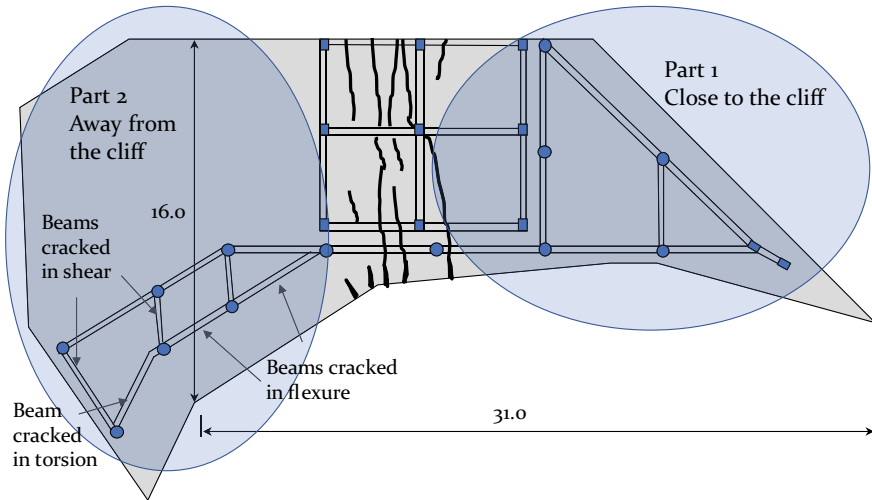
Cracking in the slab of the Panorama building
